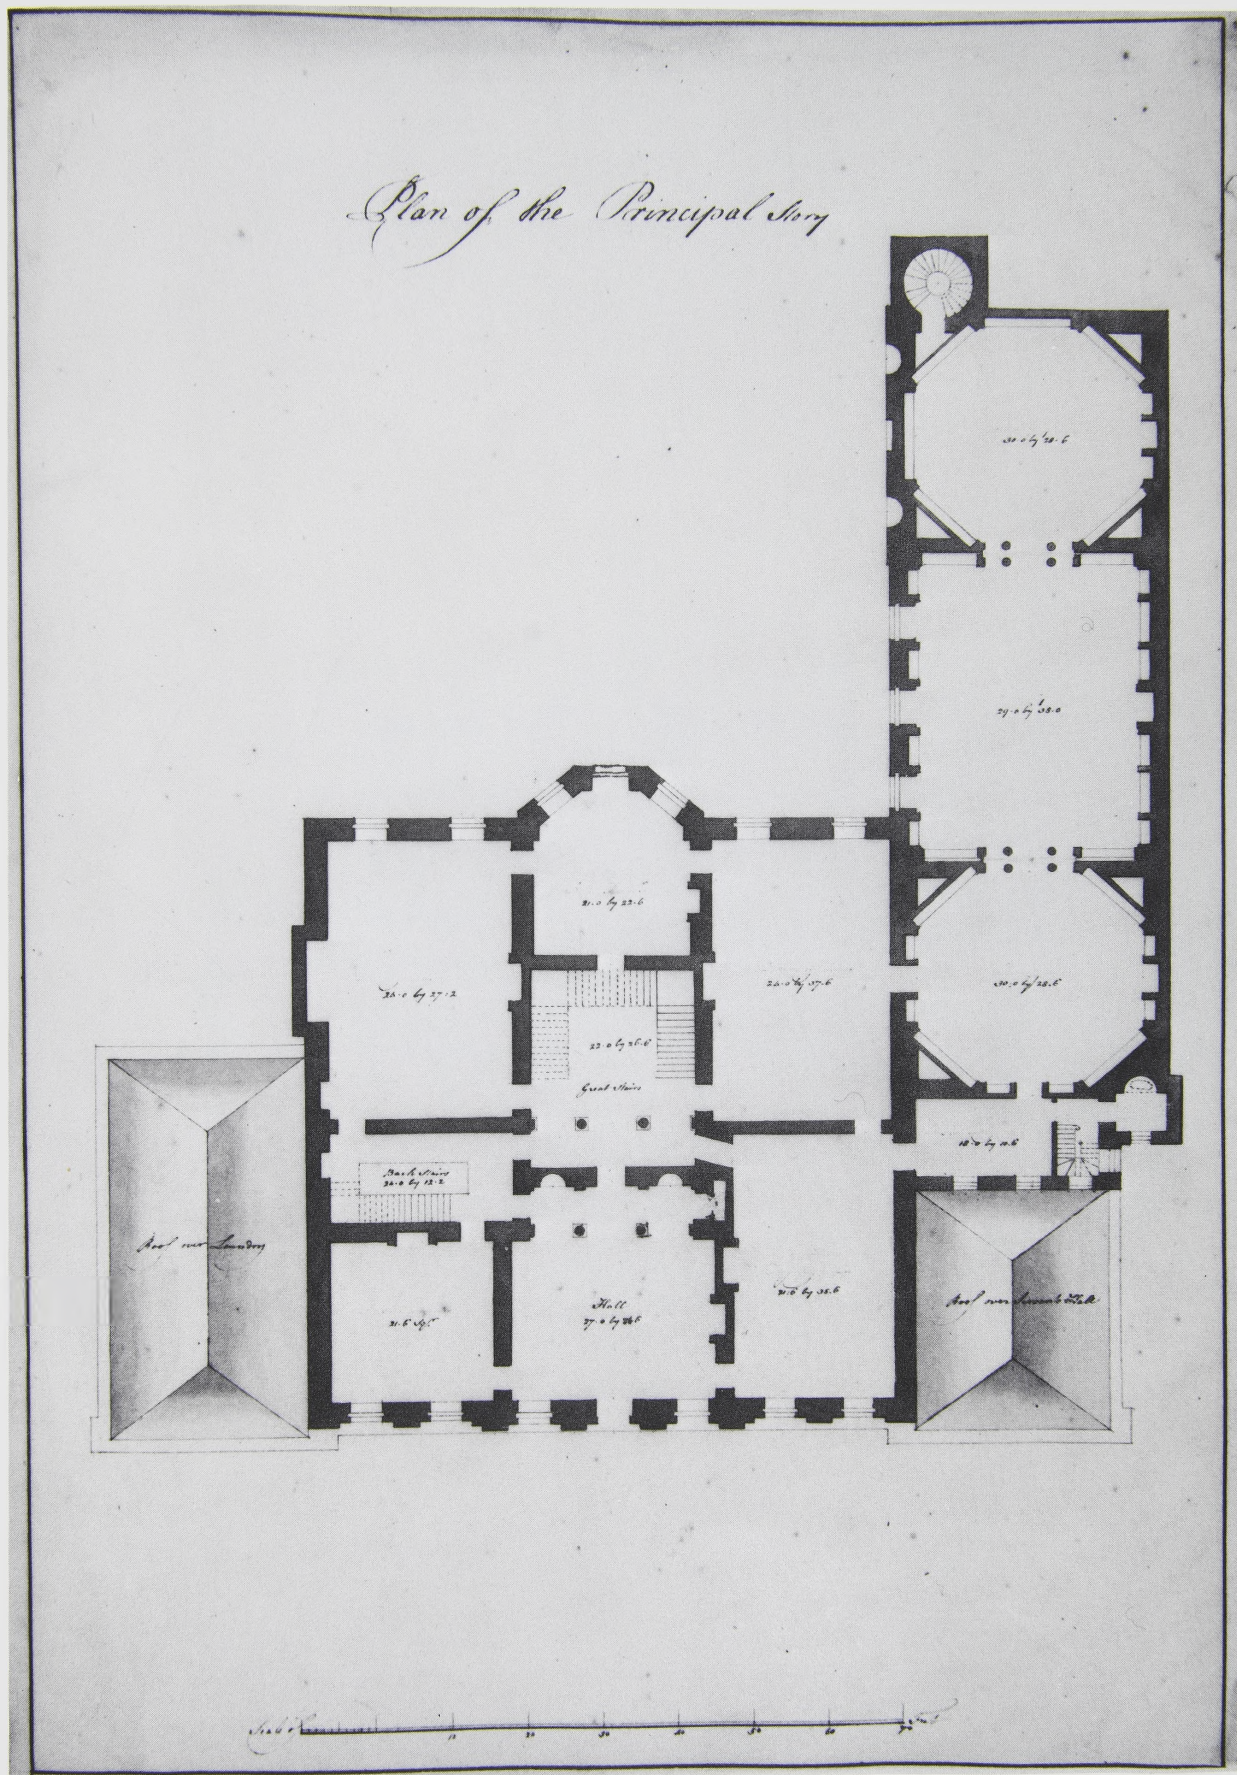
Robert Adam. London, Berkeley Square, Lansdowne House: Plan of the principal storey, c. 1761
